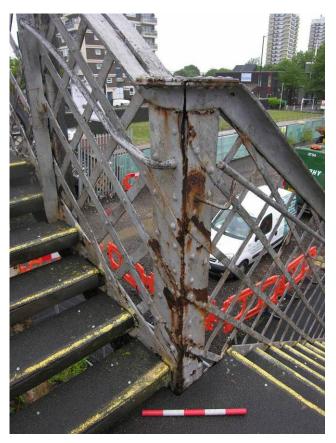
Riveted elements on the newel post on the southern side of the bridge, looking north east.
